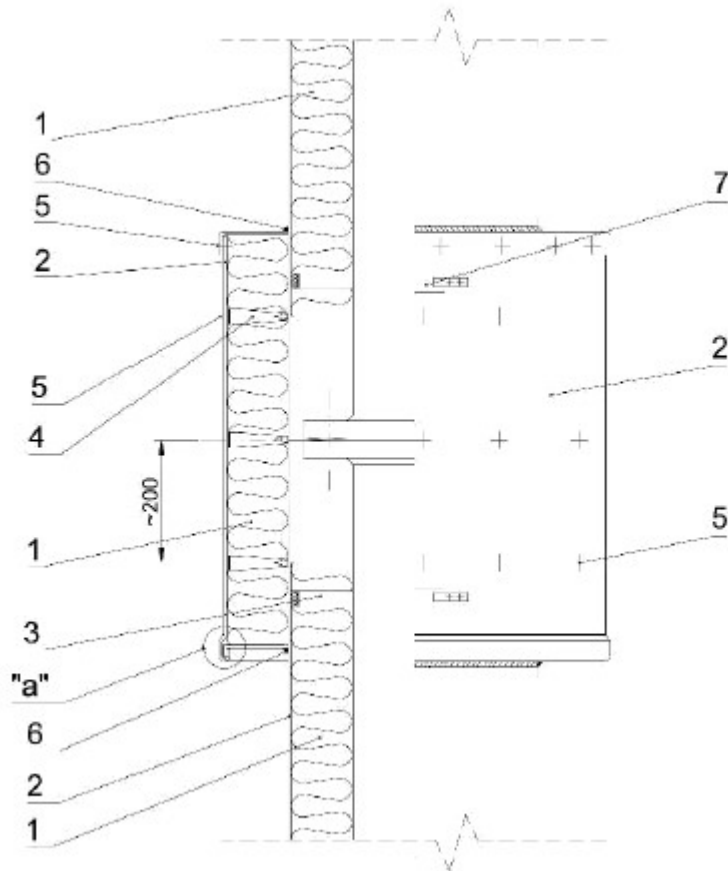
Insulation of flange connections on vertical pipelines. 1– Insulation mat, 2– Insulation covering jacket, 3 – Supporting structure, 4 – Elements fastening insulation, 5 – Tubular rivet with fastening core, 6 –Sealing with silicone putty, 7 – Hood lock
